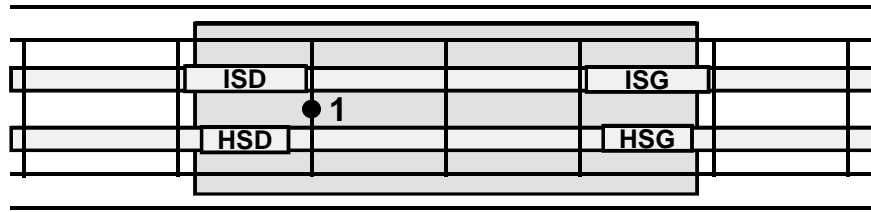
Invasive Inspection Location, Specimen 3.4
